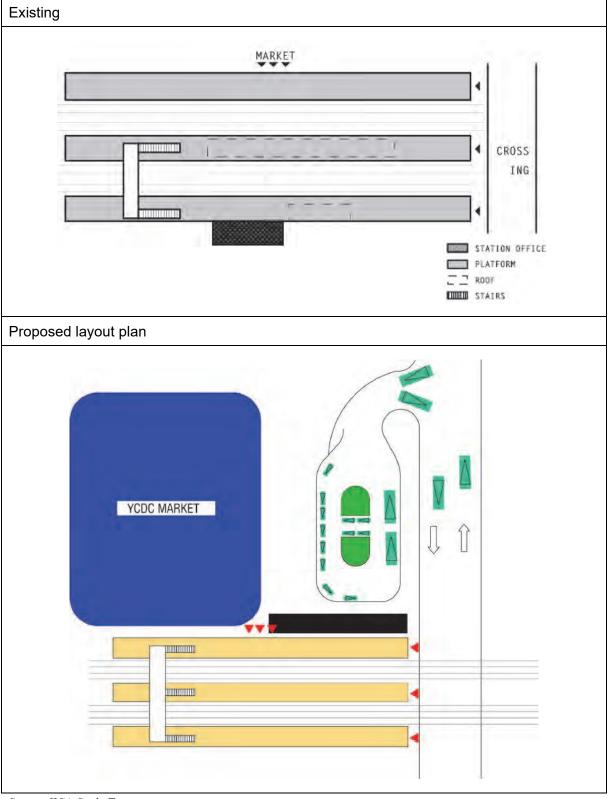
Existing and Proposed Layout Plan (Ywama Station)
